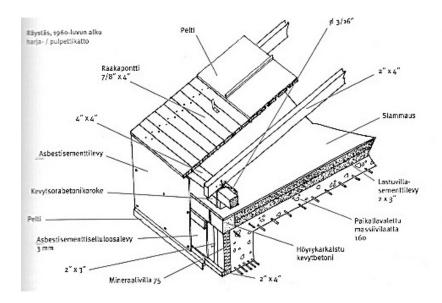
1960's eaves on a pitched or ridged roof (6, p.175)
